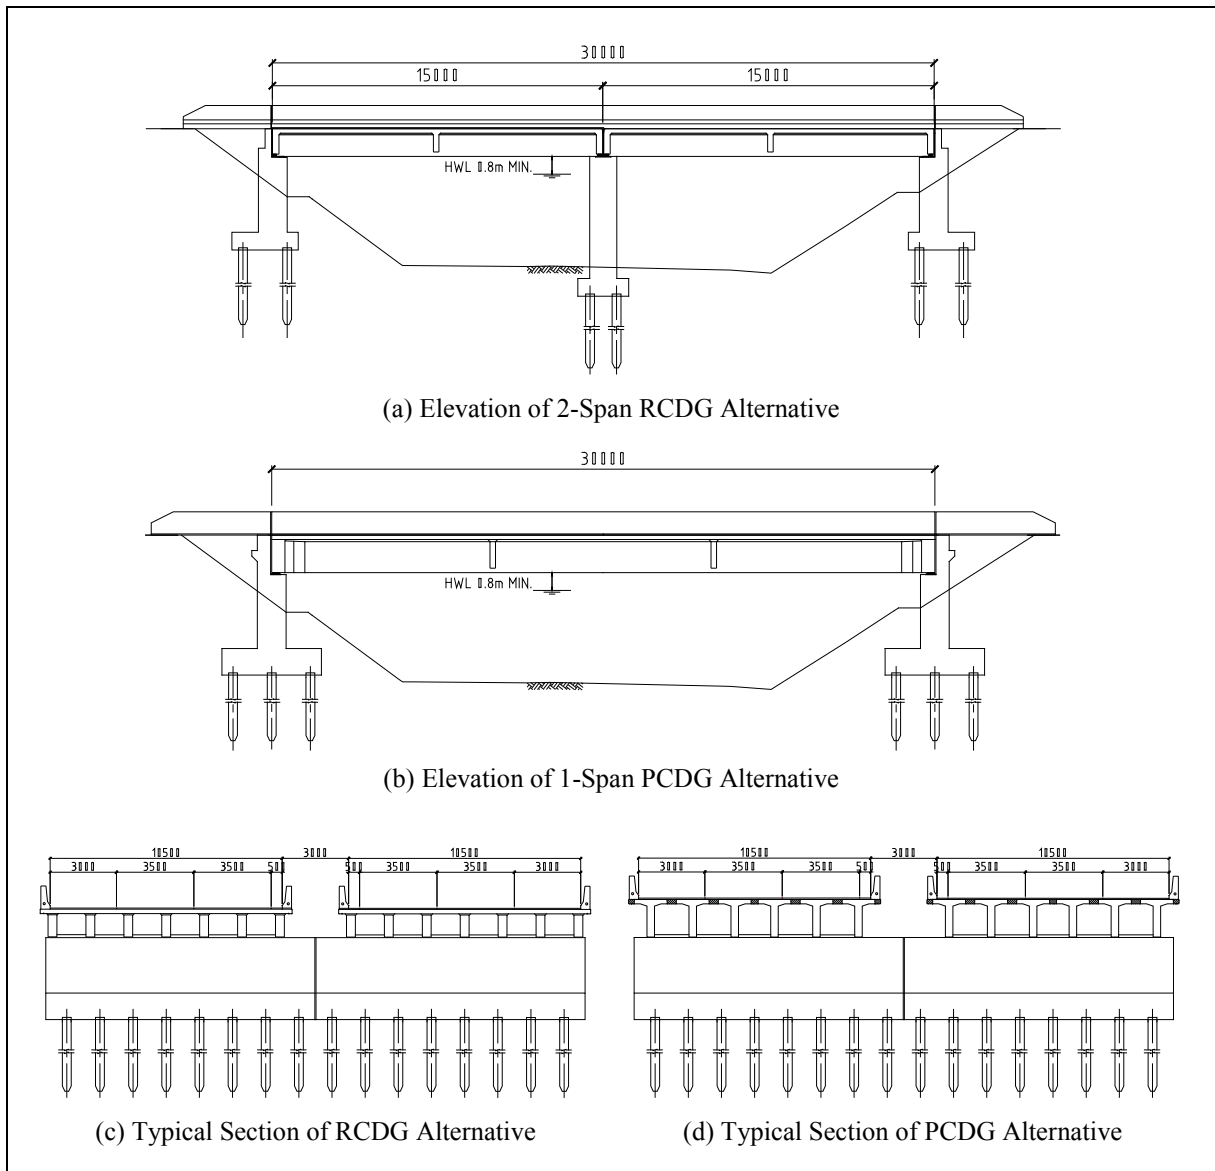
Elevation and Typical Section on the Bypass Bridge
